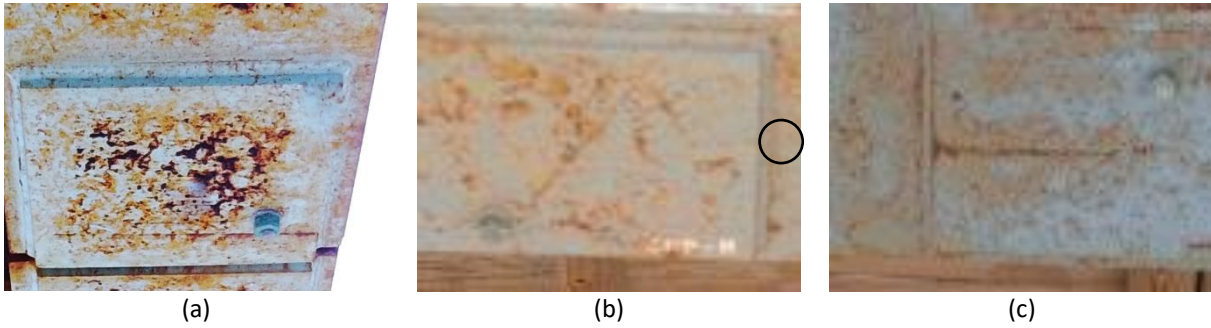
Welded plate UAV inspection (a) a true positive (hit), (b) a false negative (miss), (c) a false positive.
